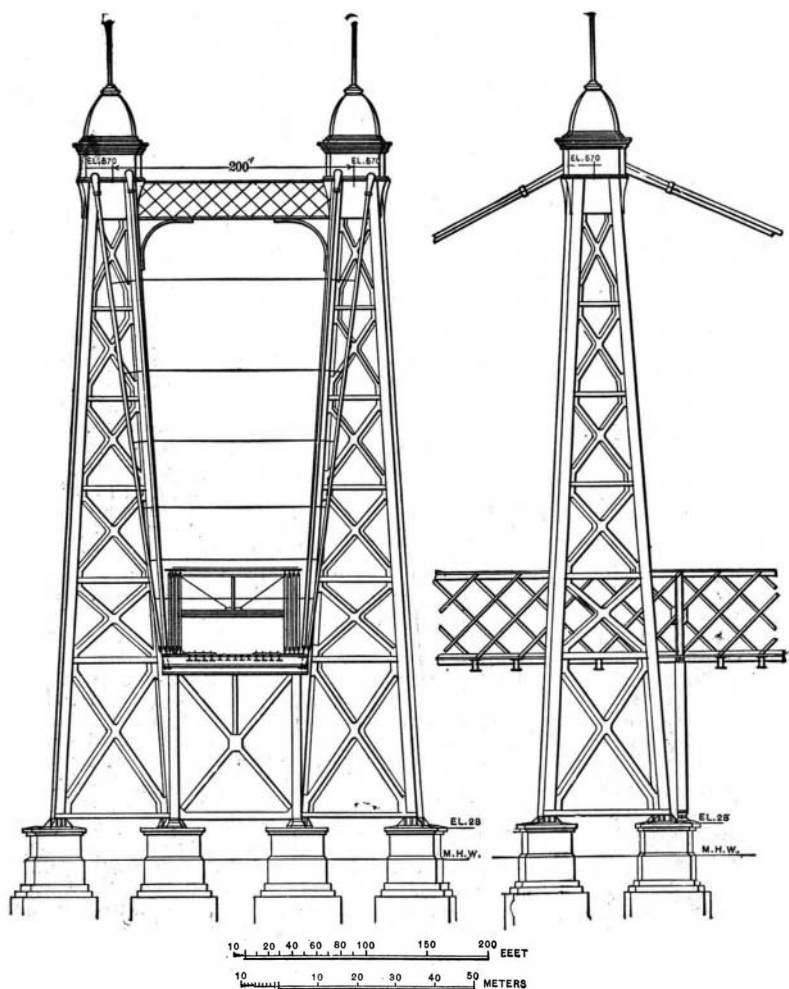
PLATE II.—FRONT AND SIDE ELEVATIONS OF TOWERS FOR 3,000 FOOT SUSPENSION BRIDGE.
